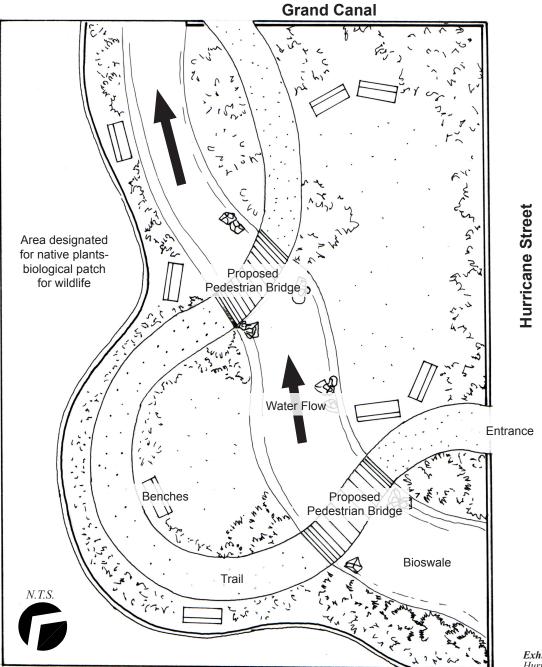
Plan view of proposed Hurricane Park, Alt 1
